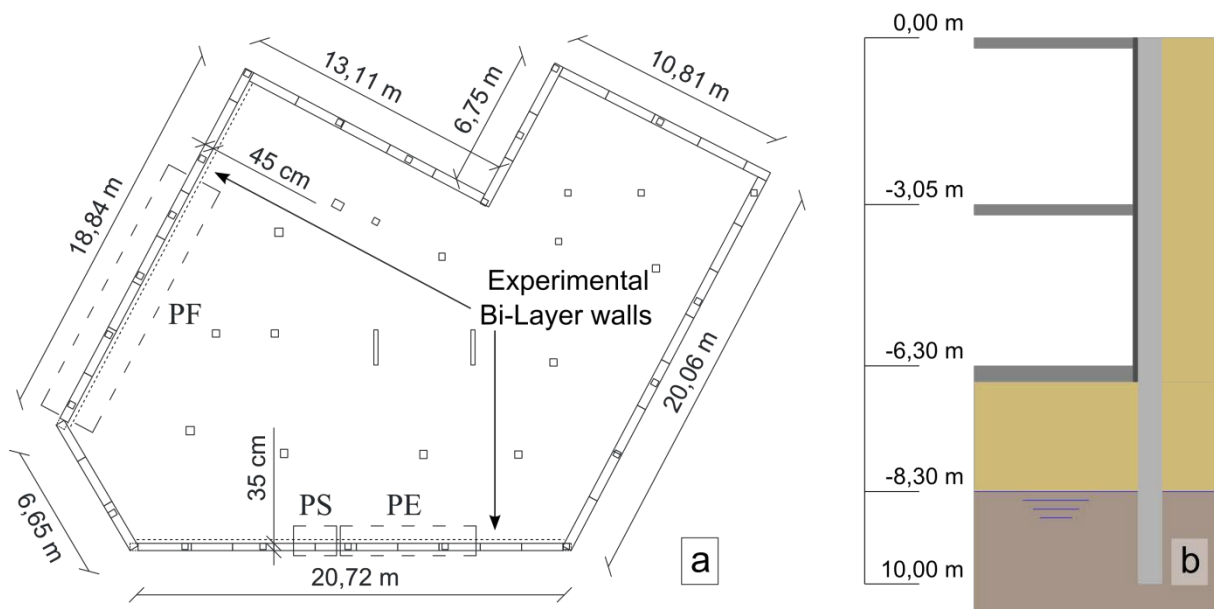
Details of diaphragm walls: (a) site plan; (b) side view.
